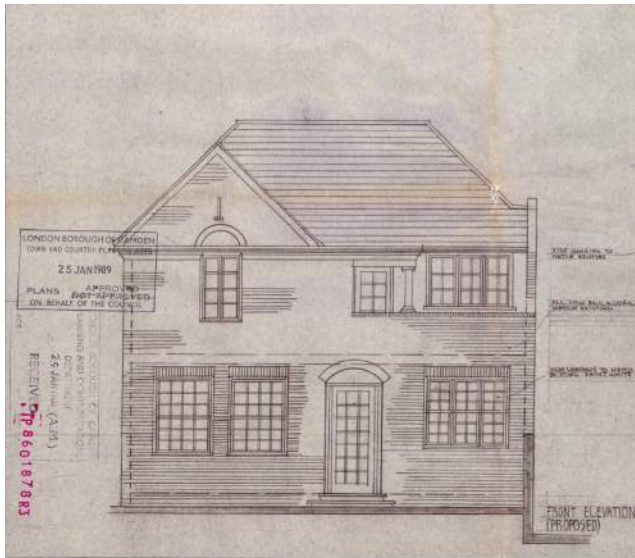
1986 - proposed front elevation of 26A Ferncroft Avenue
